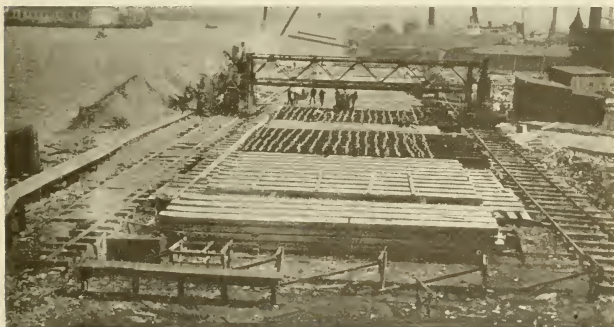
CASTING YARD FOR CONCRETE PILES.
